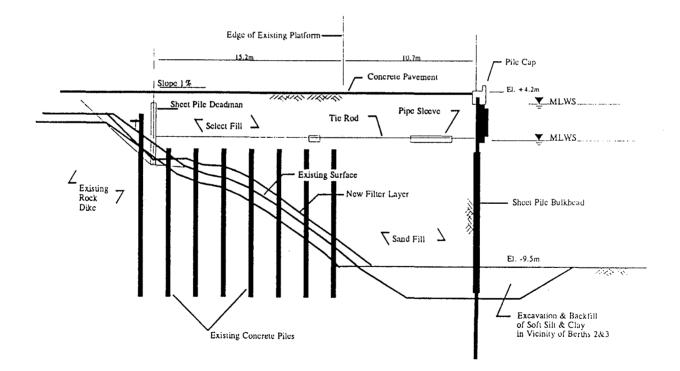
Typical section of anchored sheet pile bulkhead-Port of Kismayo.
